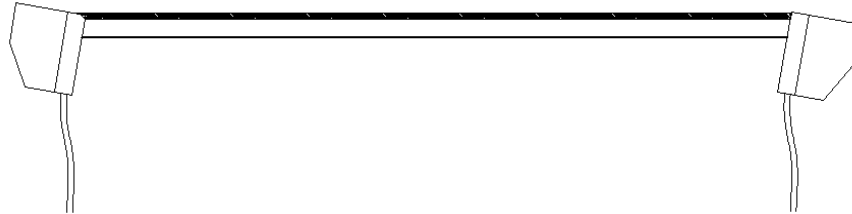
Shift of the East Montpelier Bridge towards Abutment 2 for Vertical Loads
